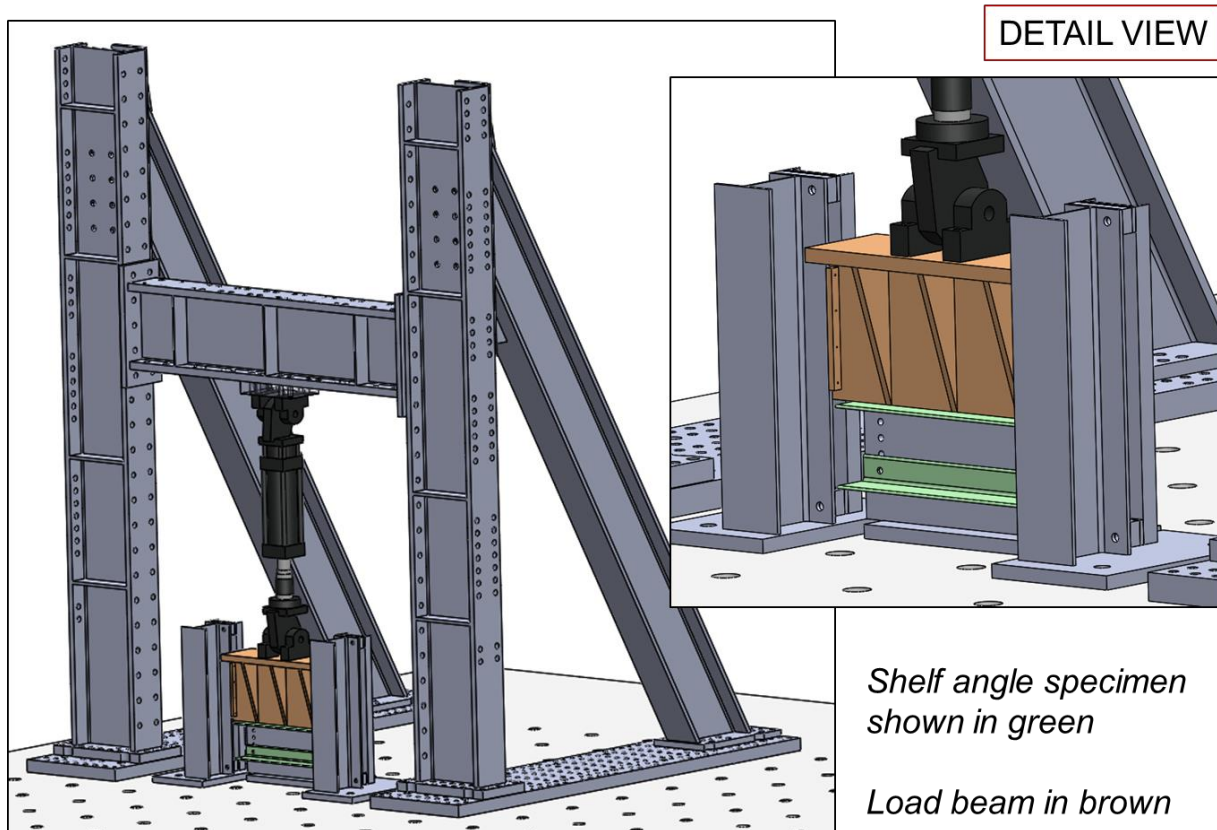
Test rig with load beam and specimen configuration shown in inset
